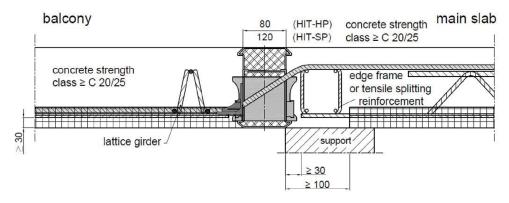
Example of the connection HIT-HP/SP ZVX to element slabs with statically effective in-situ layer
